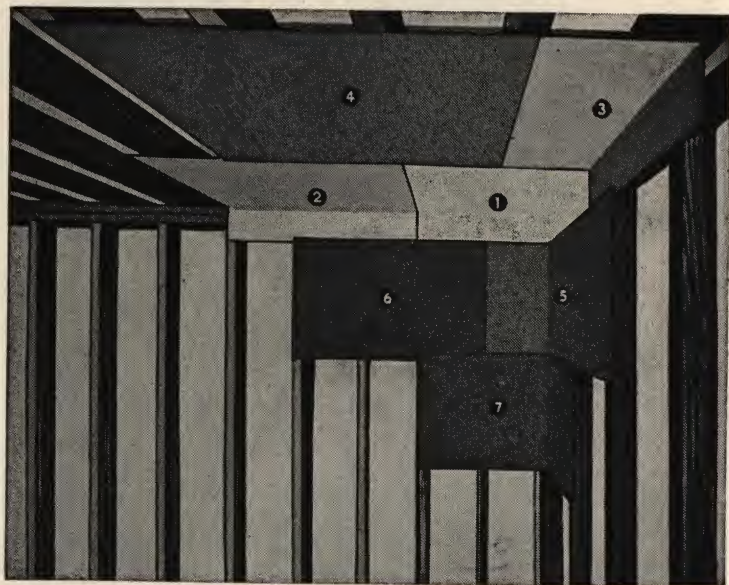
Lathing sequence. Start lathing on ceiling at corner of room as shown in this drawing. Sheet Number 1 is the key sheet. Complete lathing on ceiling, then start on the side wall.
